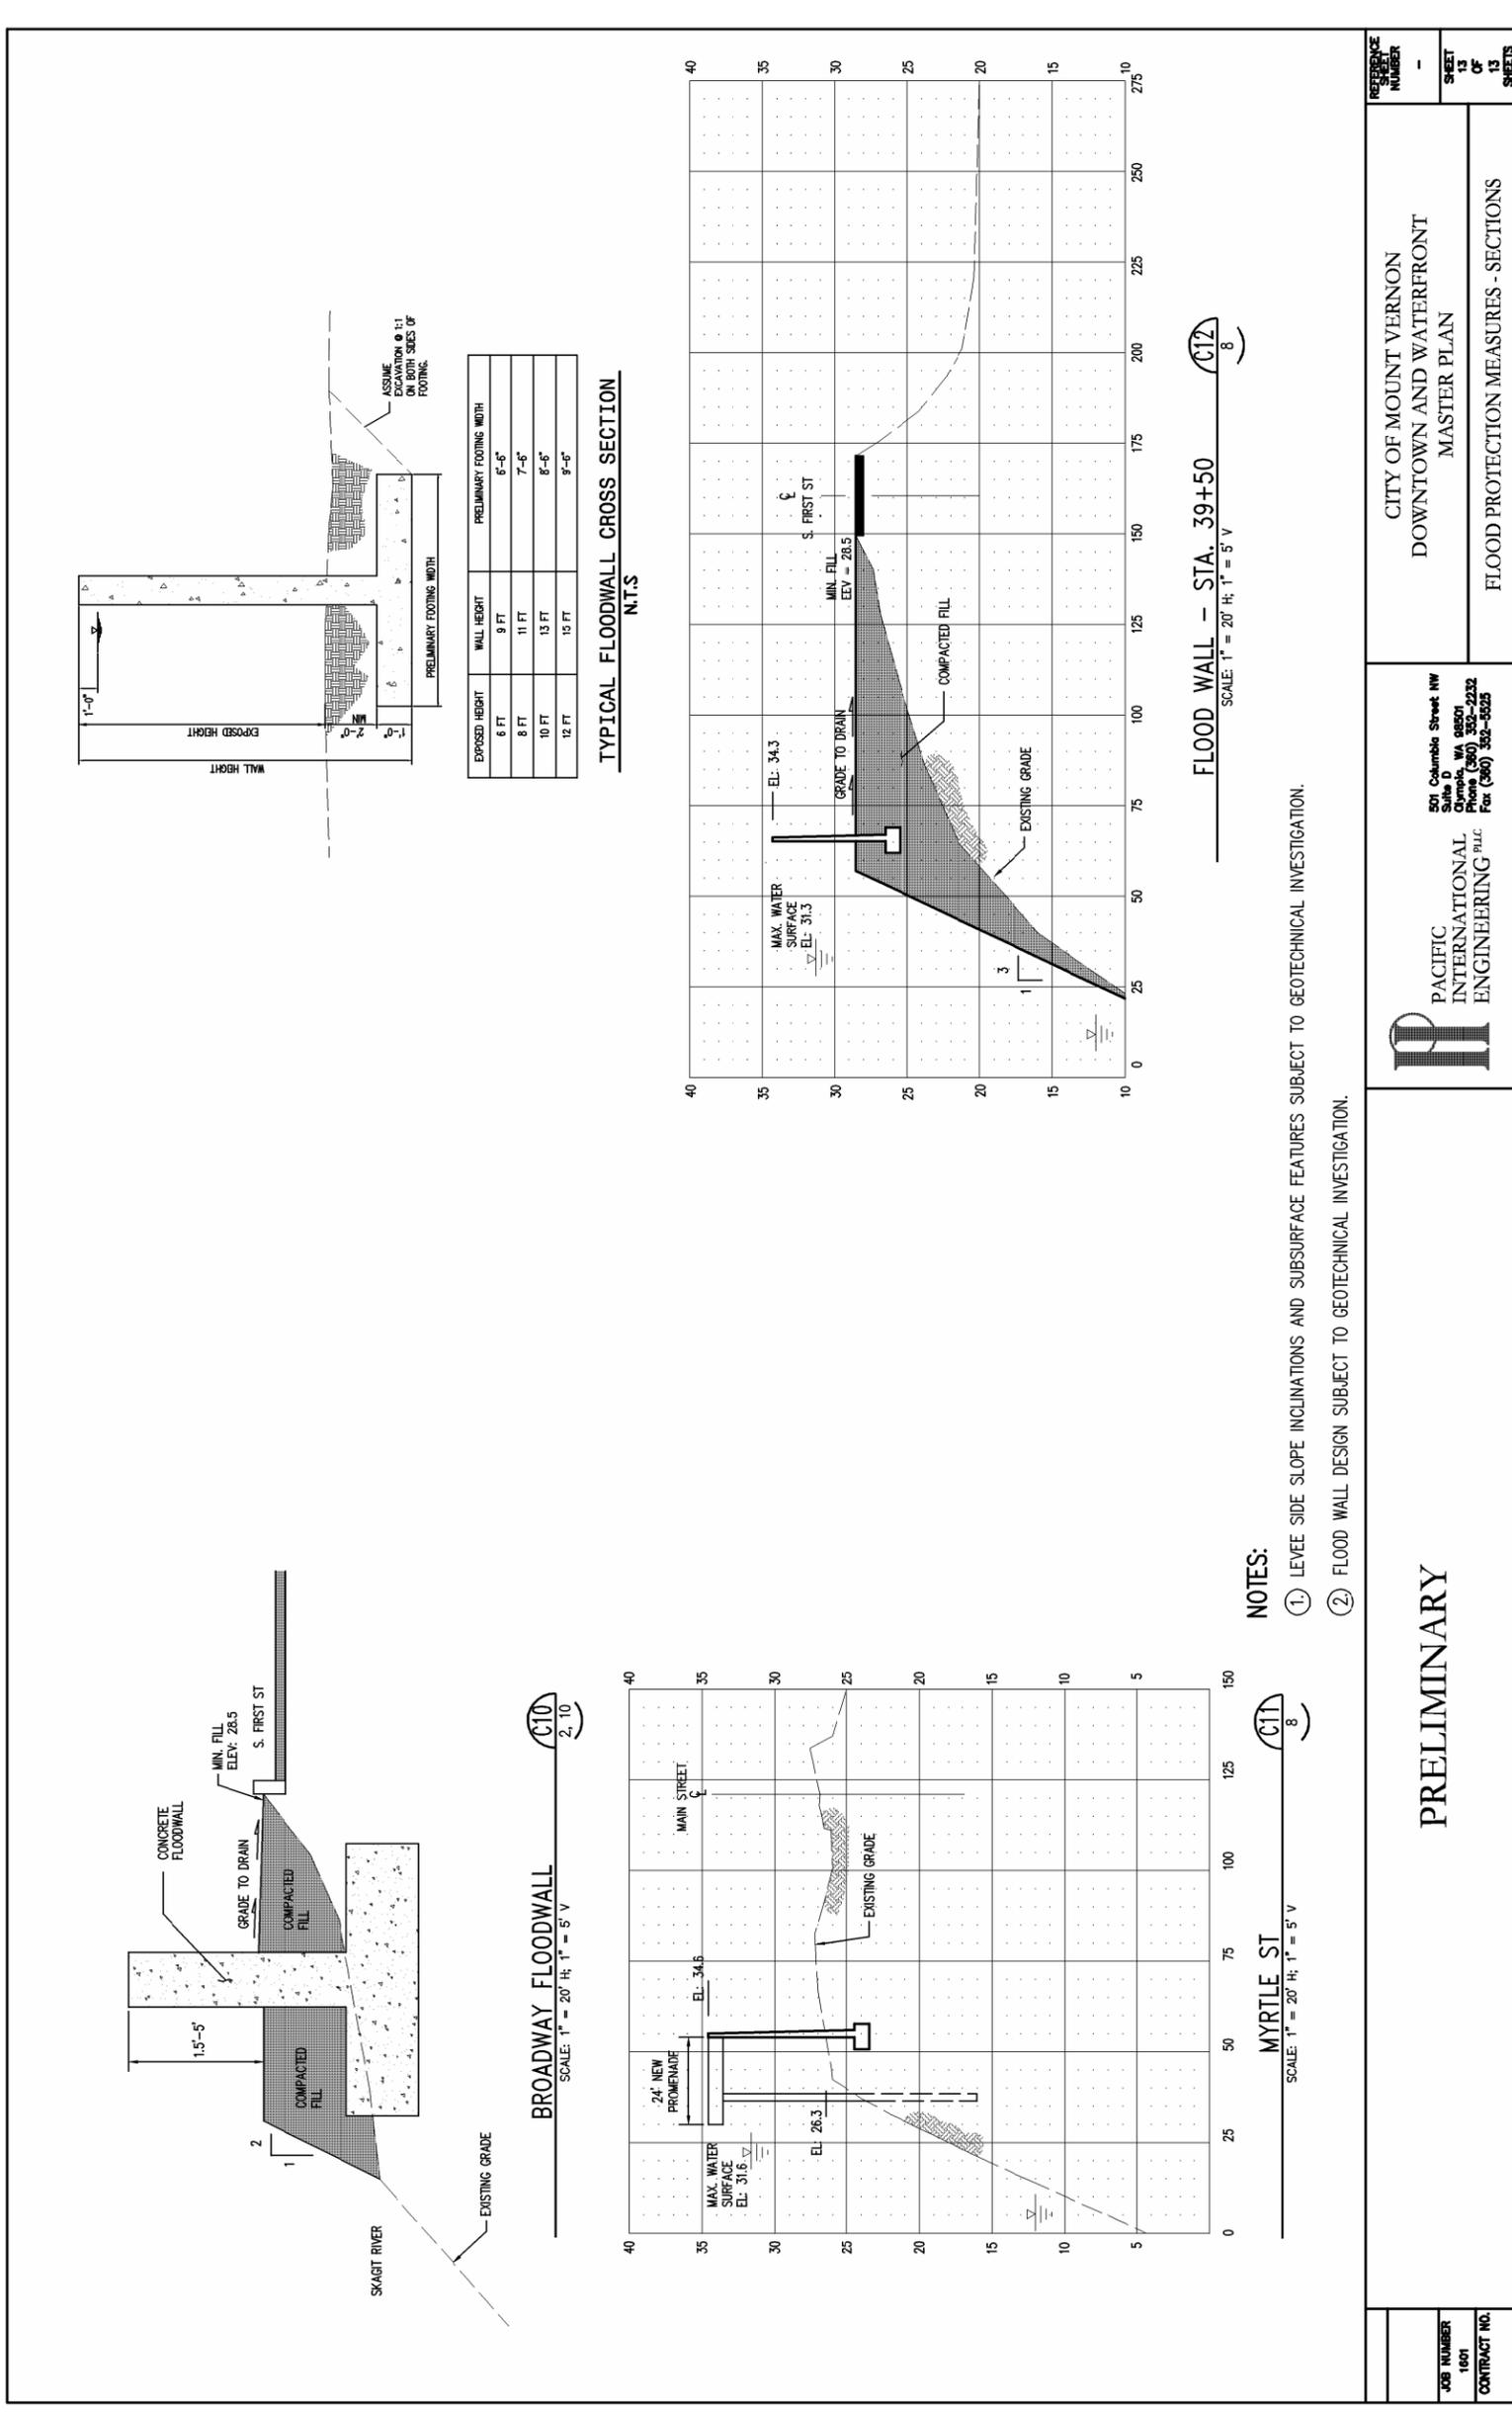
Flood Protection Alternatives – Typical Cross Sections
